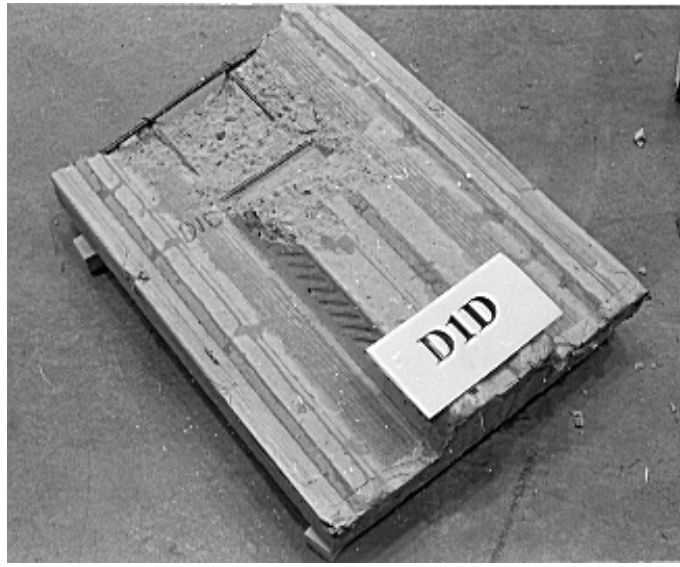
Typical Deck Slab after Shear Plane Failure.
